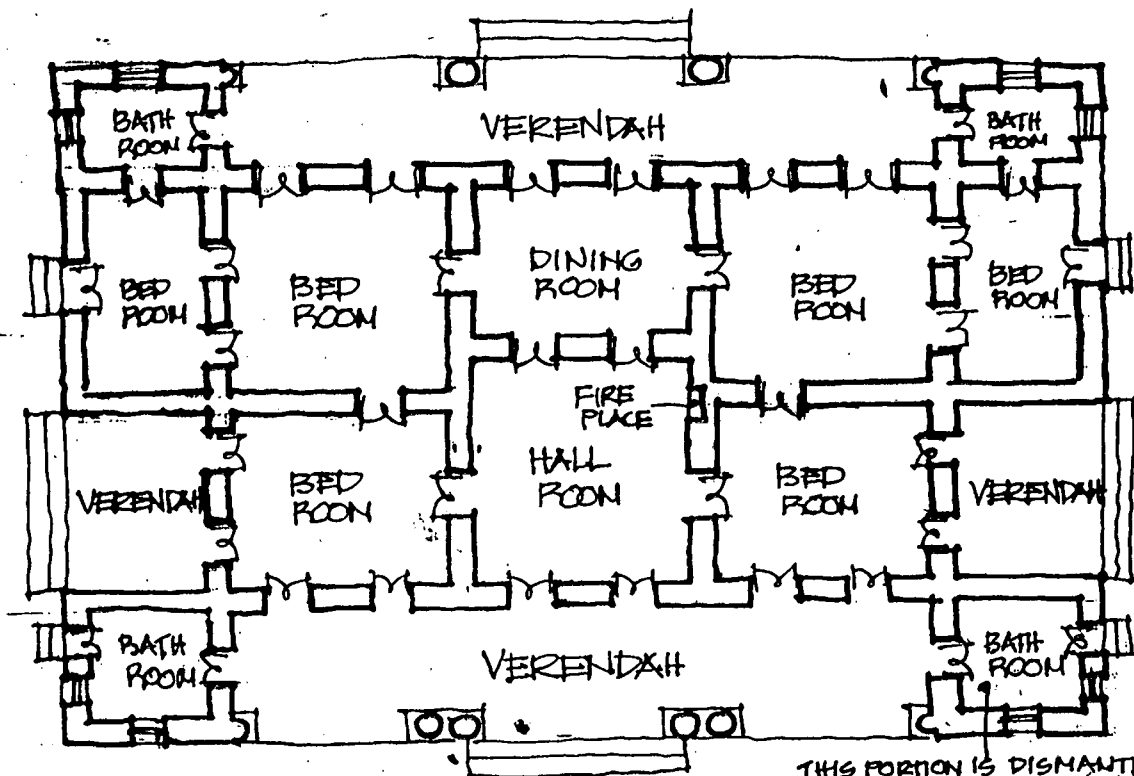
Ground floor plan, Circuit house, Rajshahi
